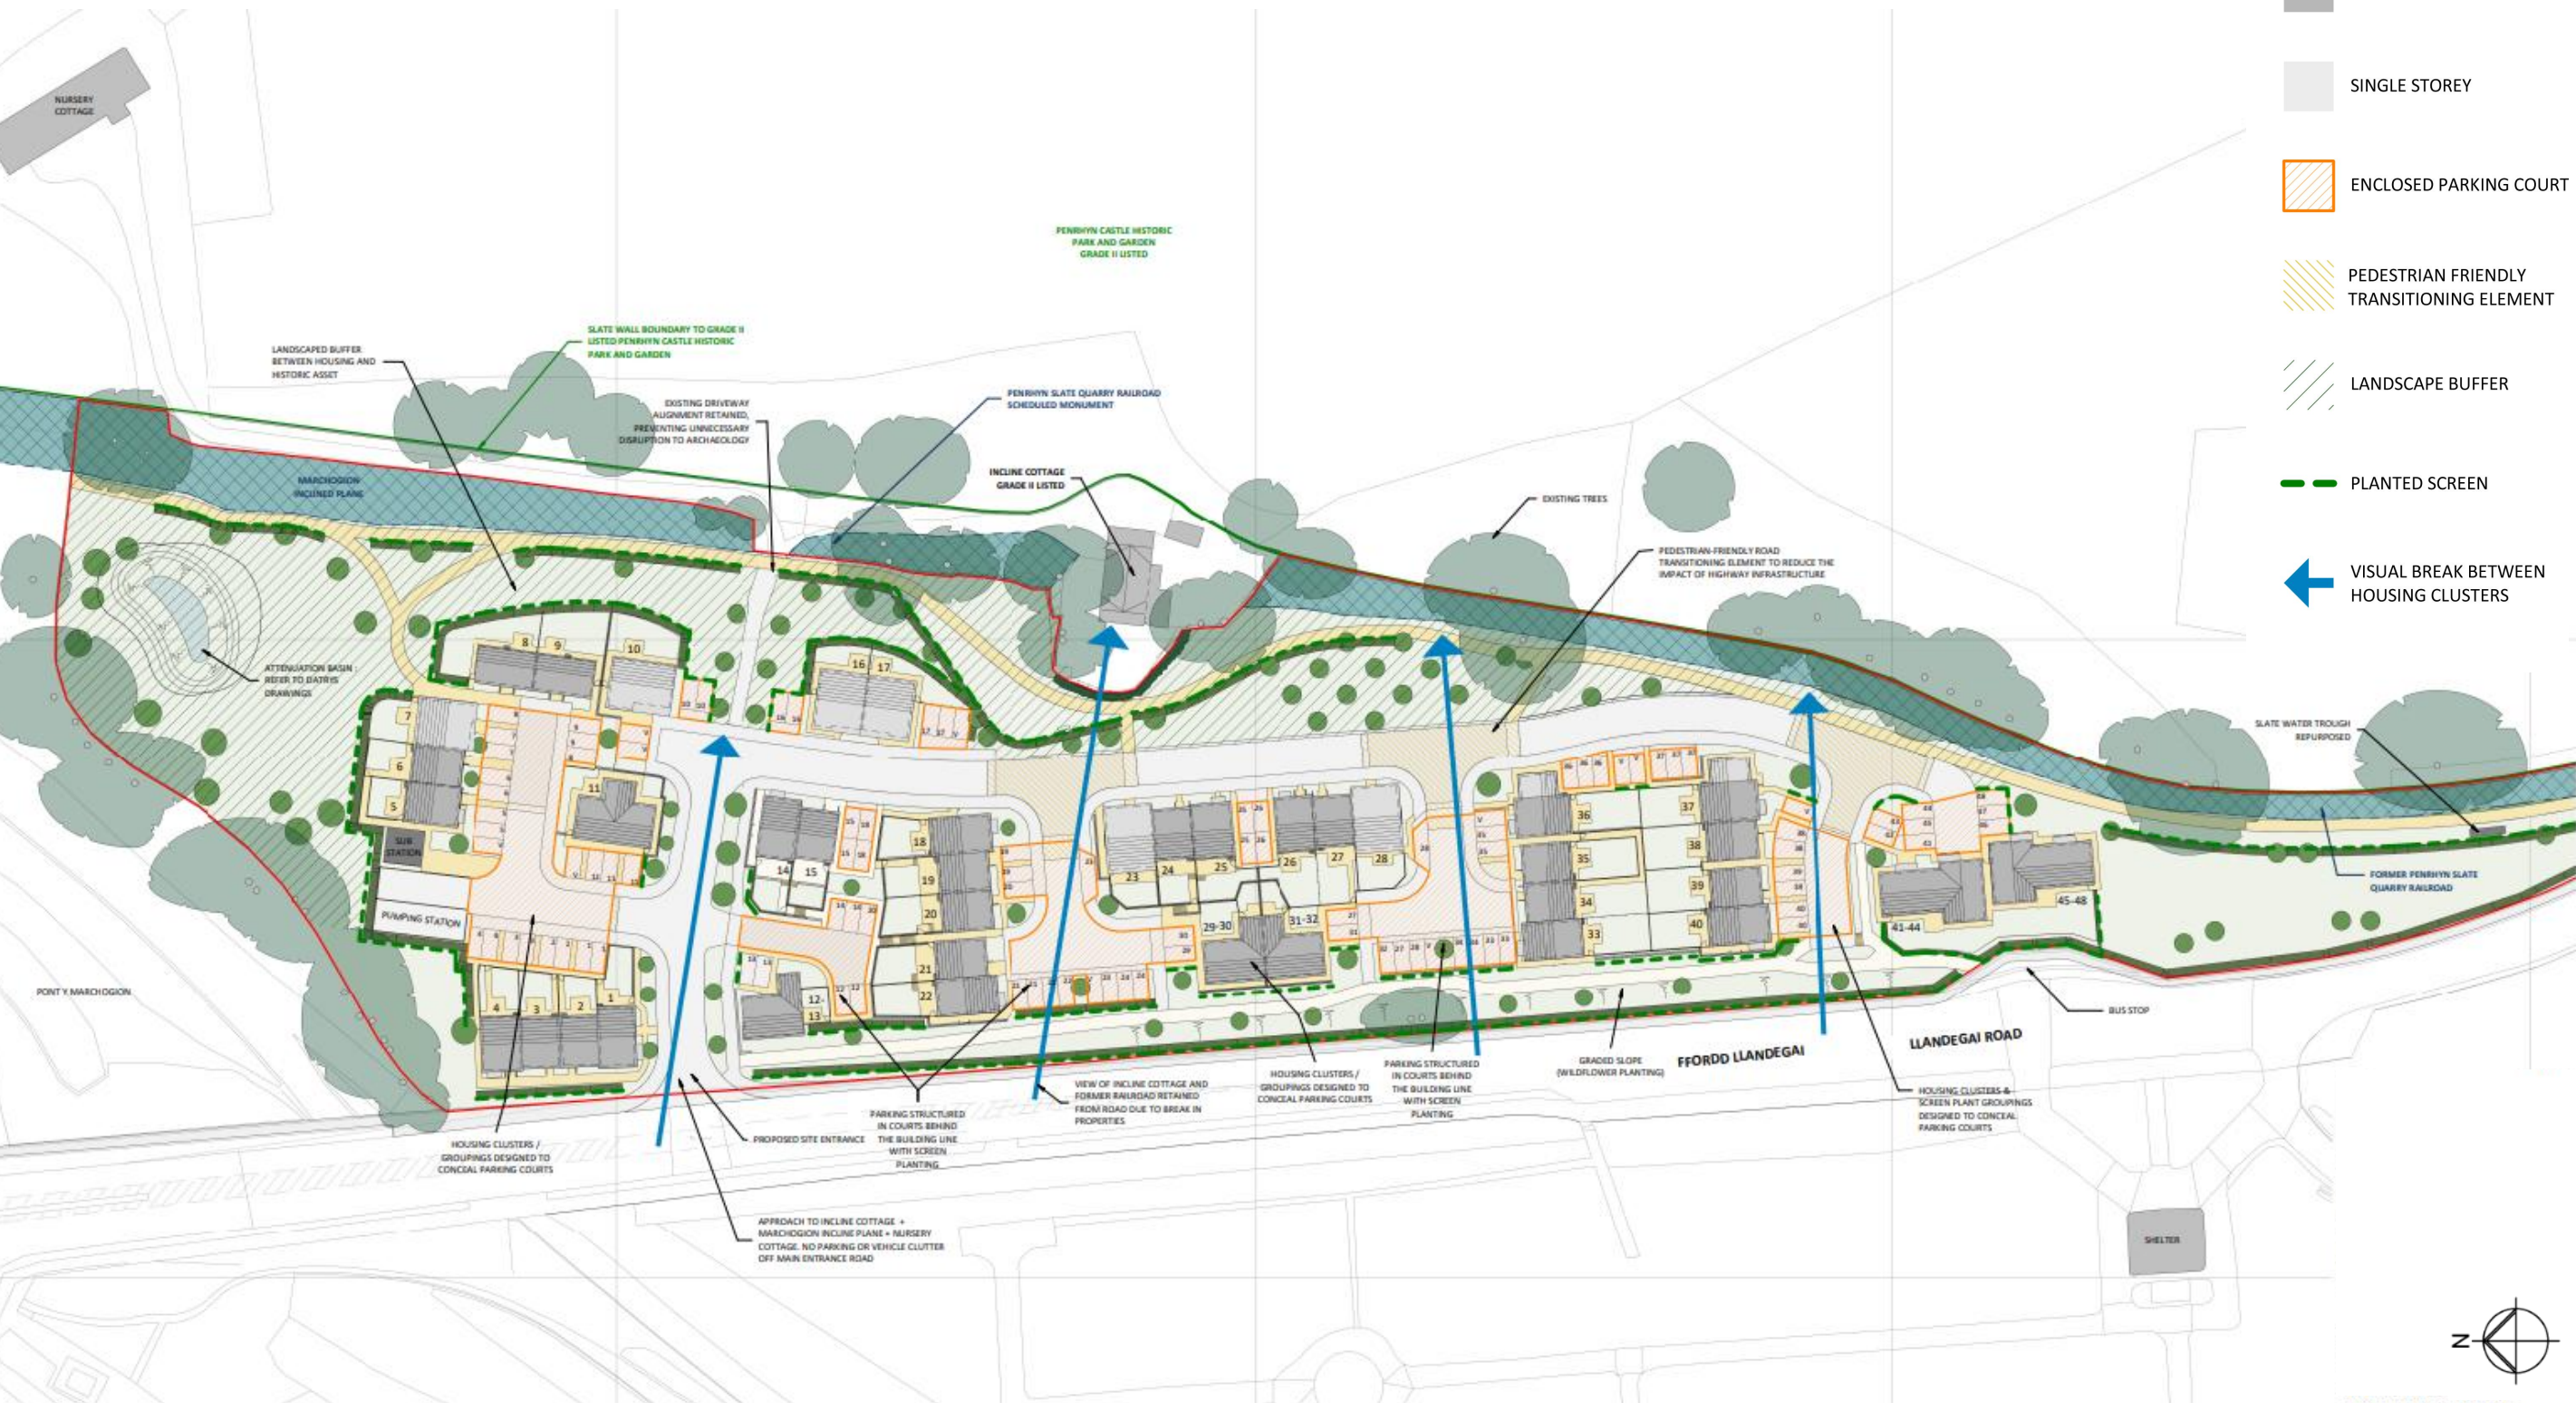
HOUSING & PARKING IMPACT ASSESSMENT Proposed Plan
